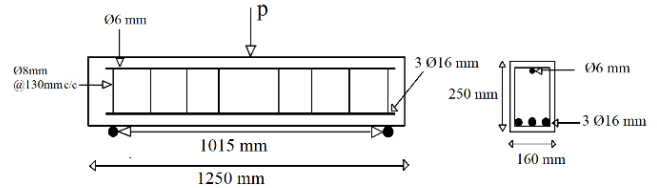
Dimension and reinforcement details of RC-beams used in current study
